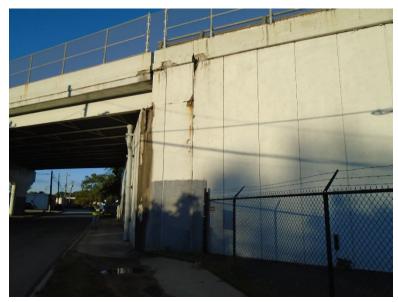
Forward-right wingwall, cracking and minor delaminations/spalling
